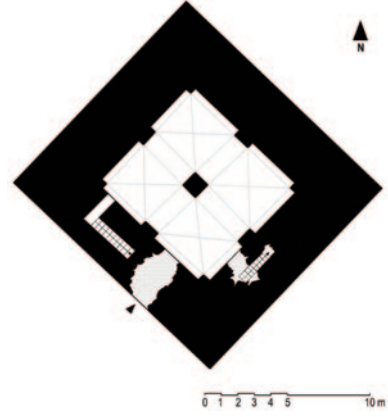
Floor plan of the Tower of Mardaliç Island (after Arel 1991, p. 11, fig. 1).
